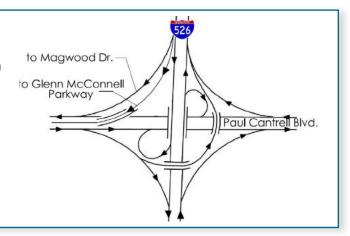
I-526 at Paul Cantrell Boulevard Alternative 2
